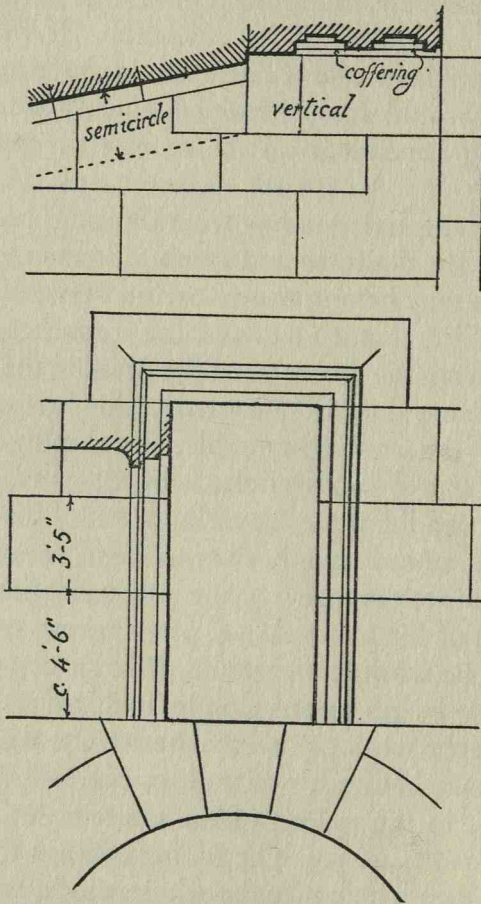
Above: The Didymaion. Long section through top of ramp leading to cella, showing roofing stones. Below: Baalbek. Wall-opening in east return of south outer wall.
